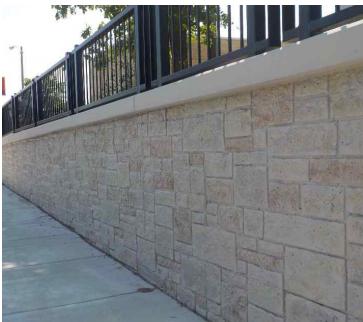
Example of post-and-panel wall system with stone block façade, The finish can be altered to match a natural stone look with staining and concrete forms.
